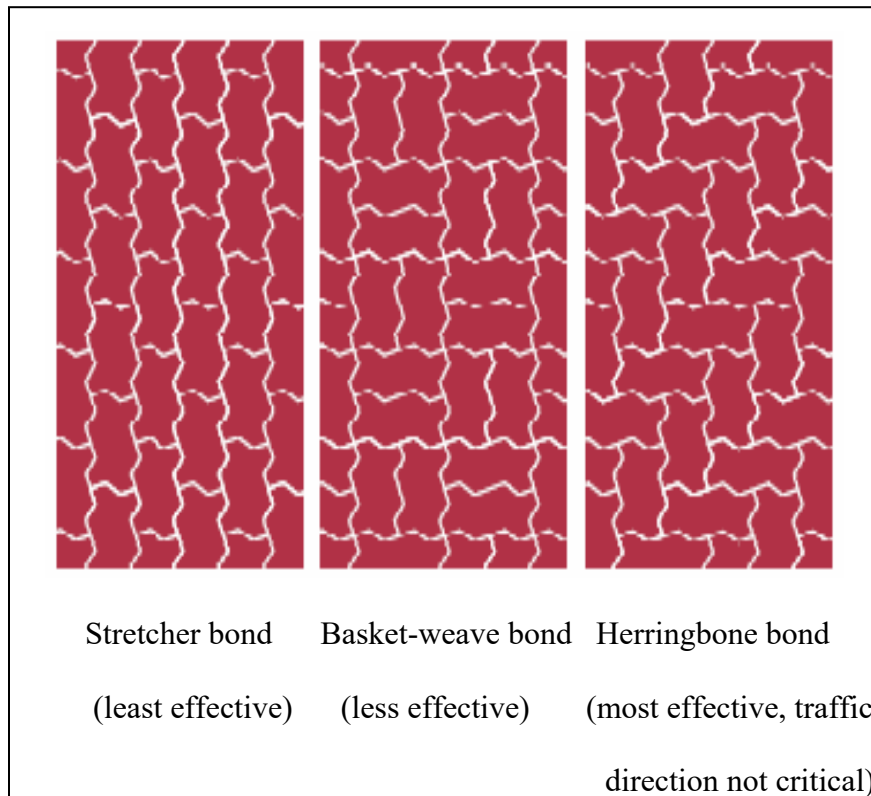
Common laying pattern of concrete pavement blocks (Ling, 2008)
